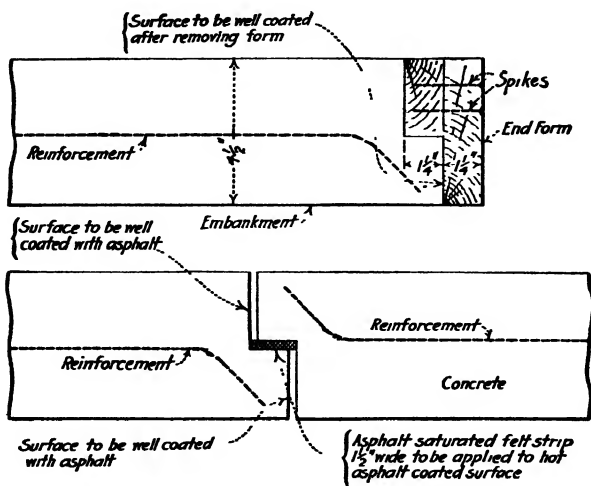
An expansion joint for concrete reservoir linings, Vancouver.
